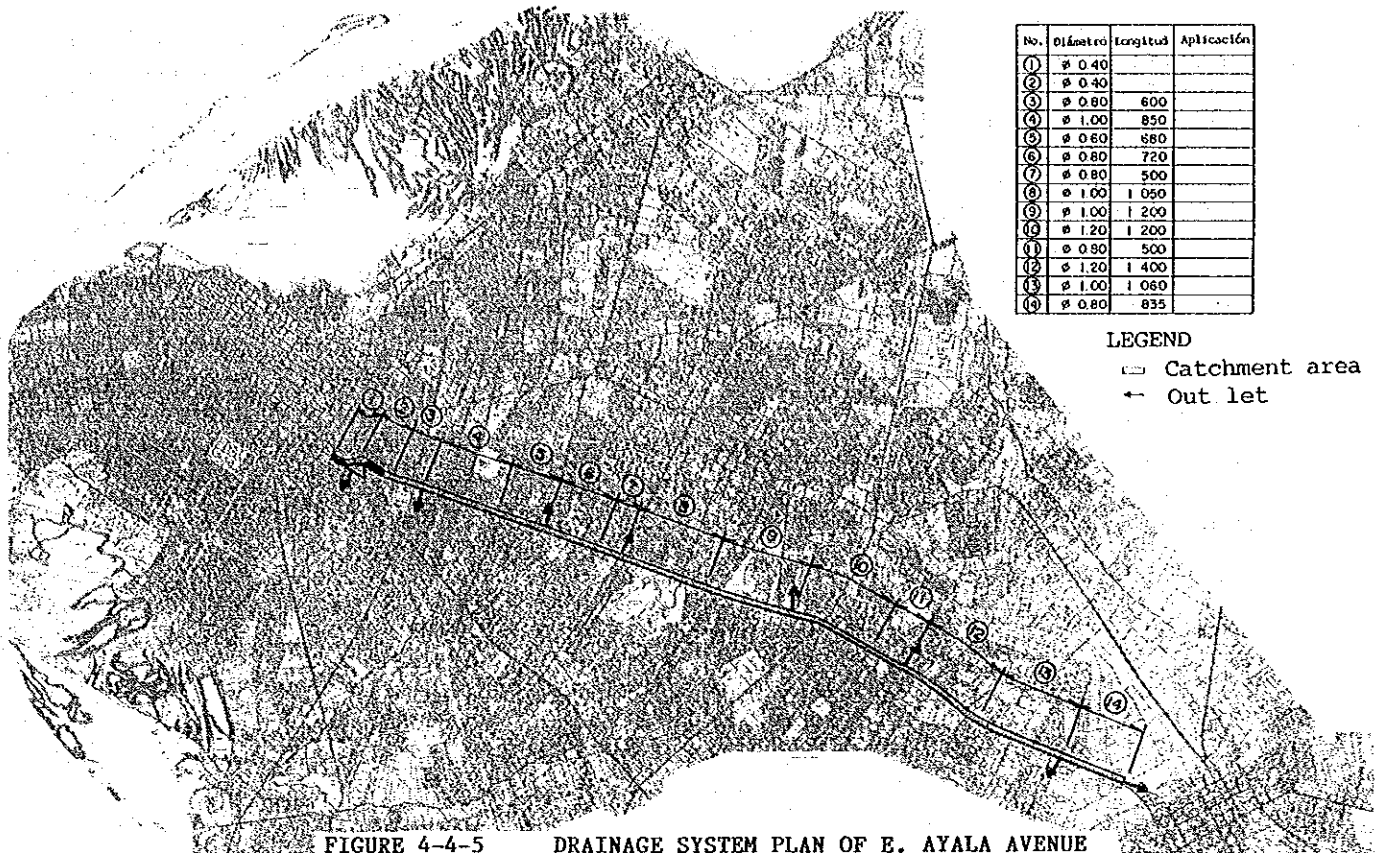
DRAINAGE SYSTEM PLAN OF E. AYALA AVENUE
